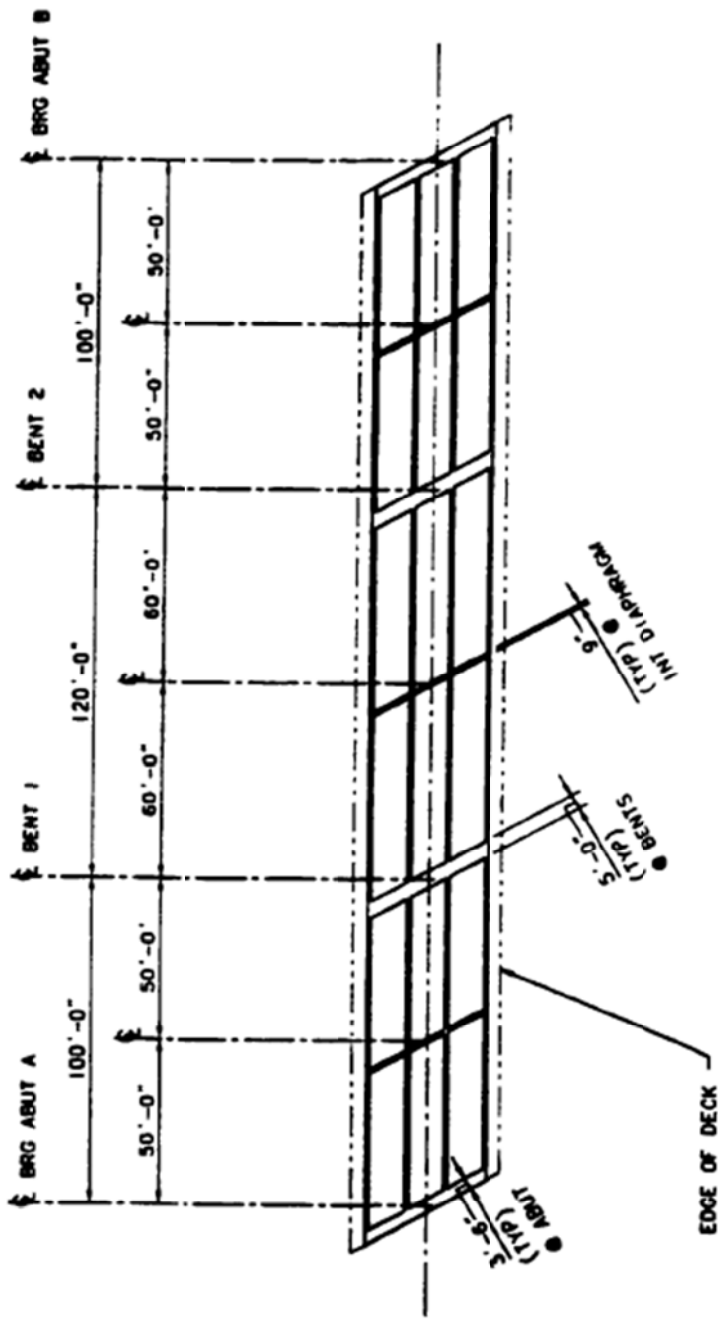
Bridge No. 2 – Seat Type Abutment
